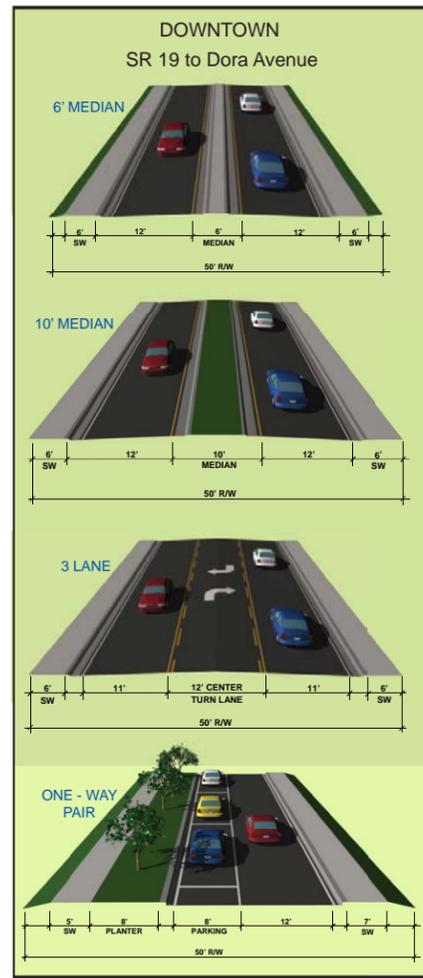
Alfred Street Corridor Study, Proposed Alternatives Downtown Tavares CRA
